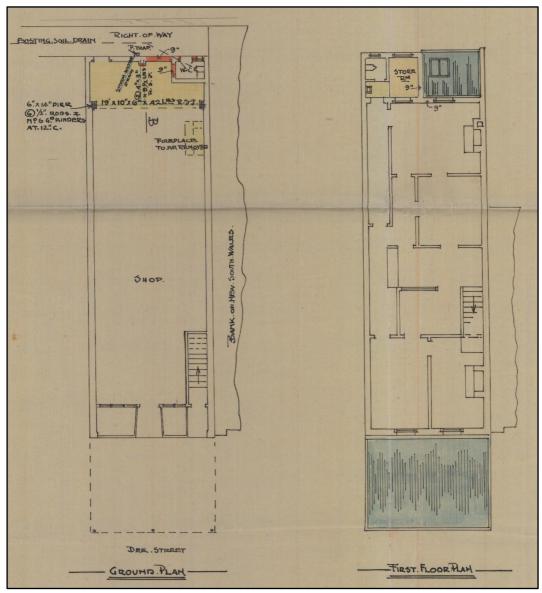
Detail from 1933 plan showing alterations to the interior layout of the building at 5 Dee Street (Brodrick & Royds, 1933).
